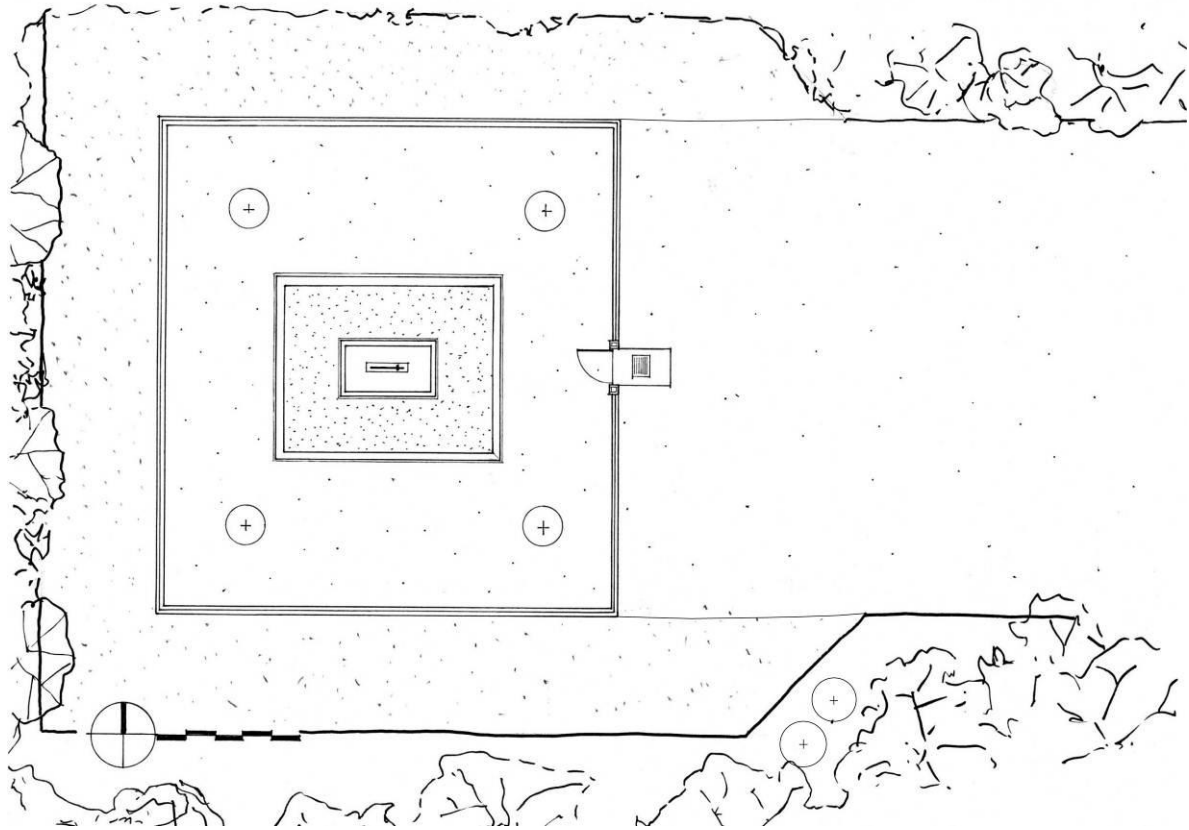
Plan of General Bridges' Grave (Source: Pip Giovanelli , 2011)
